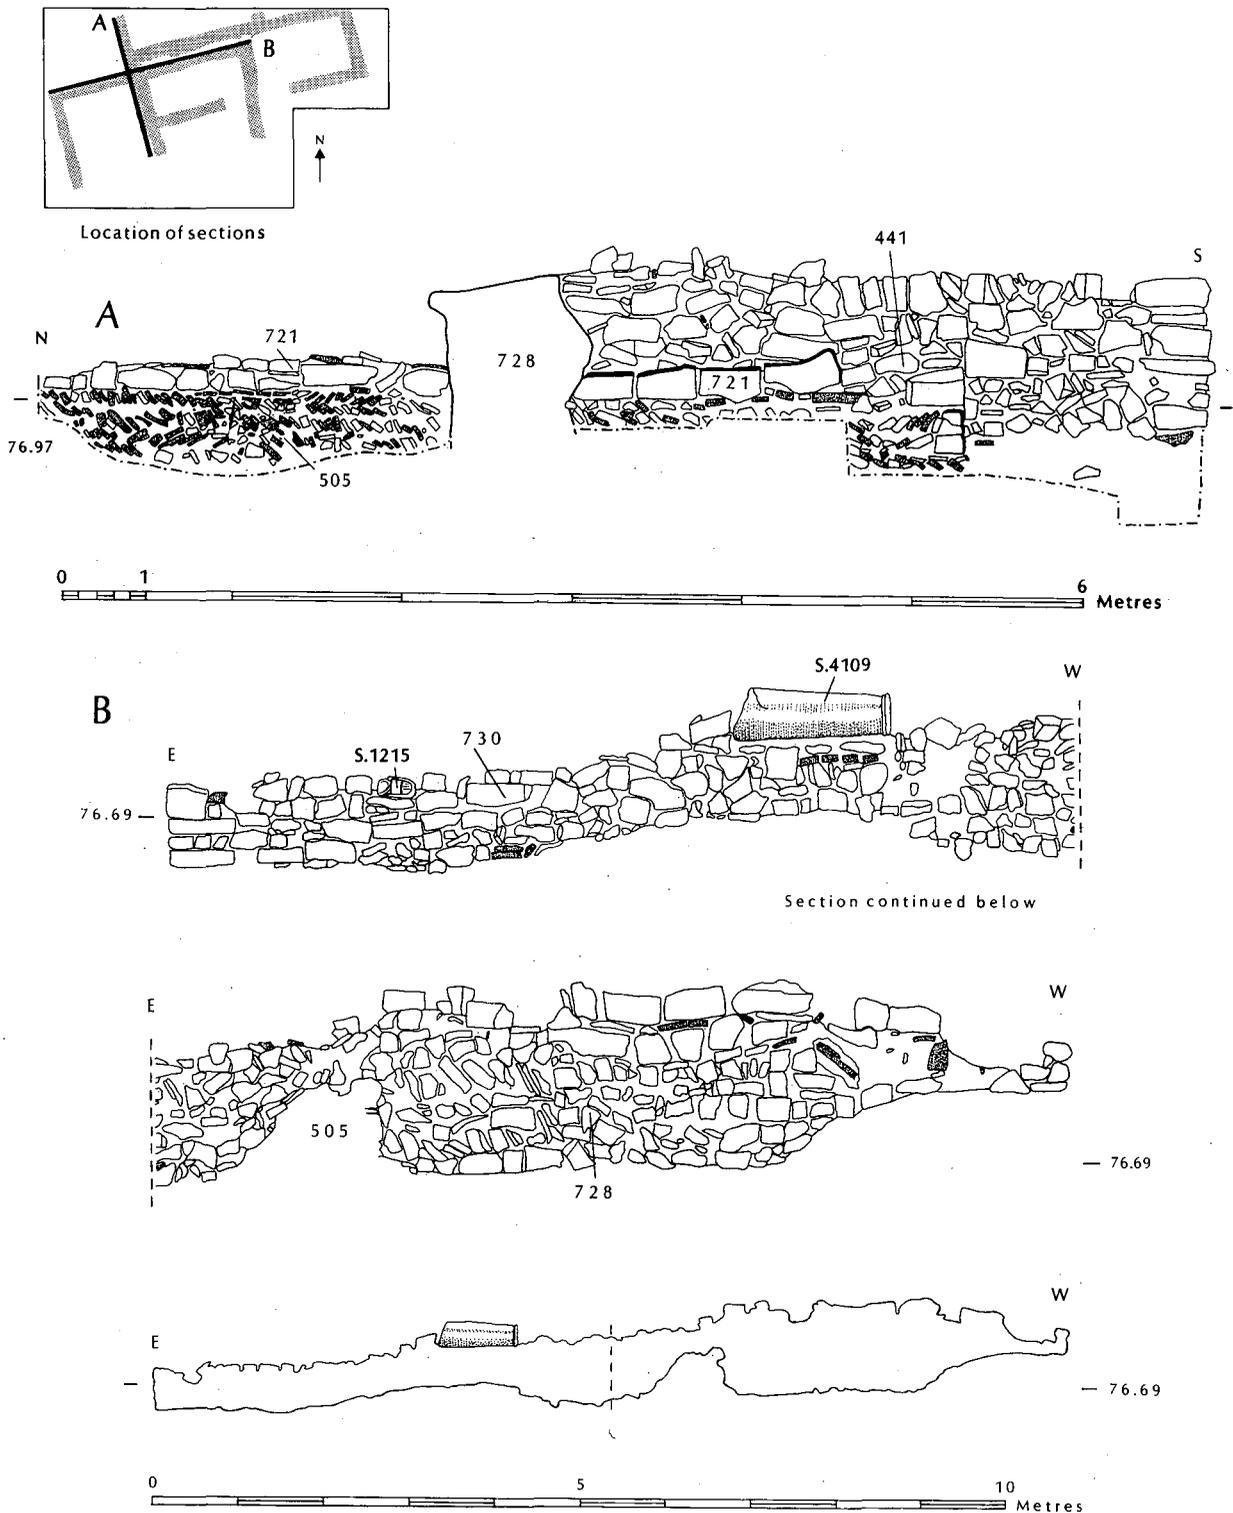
Area D. Elevations. A. The west wall of the Period 3 early building under the medial wall of the Period 5 workshops. B. The north face of the north wall of the Period 5 workshops.
